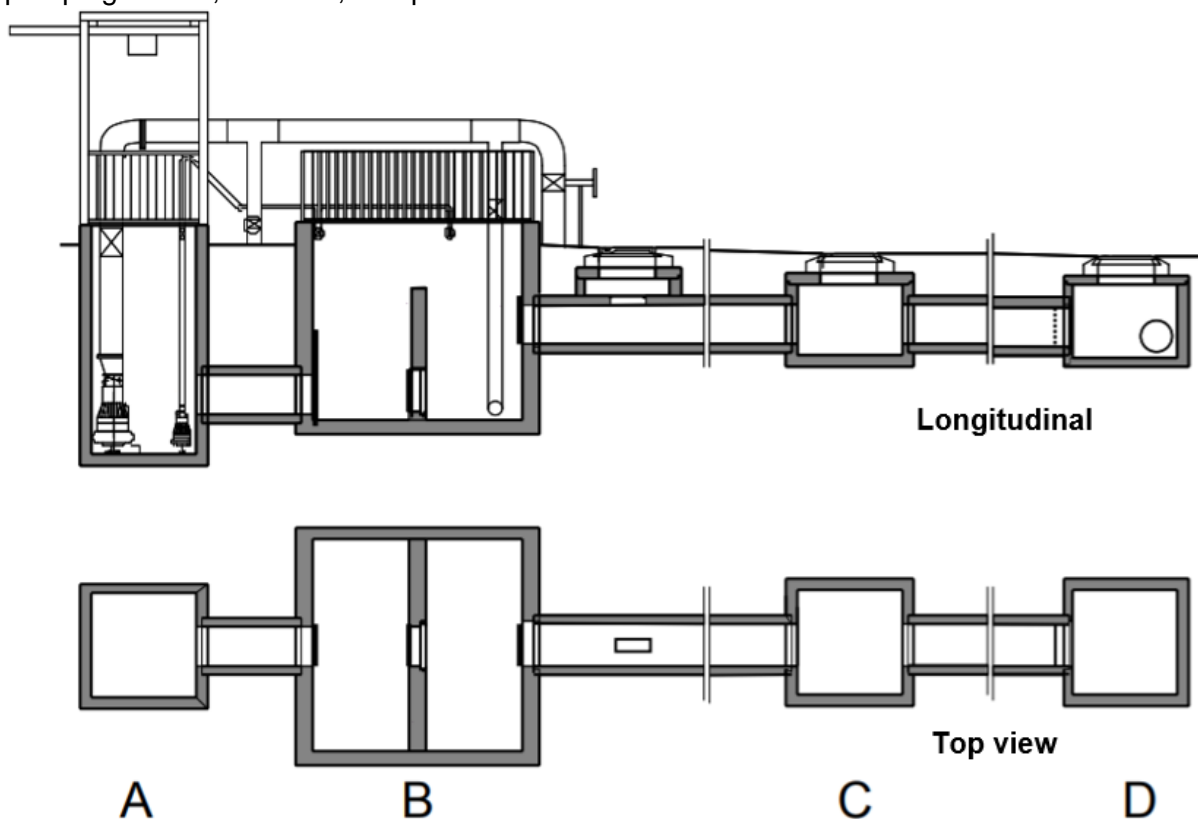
Longitudinal section and top view of the test set-up B (STOWA & Stichting RIONED, 2009)
